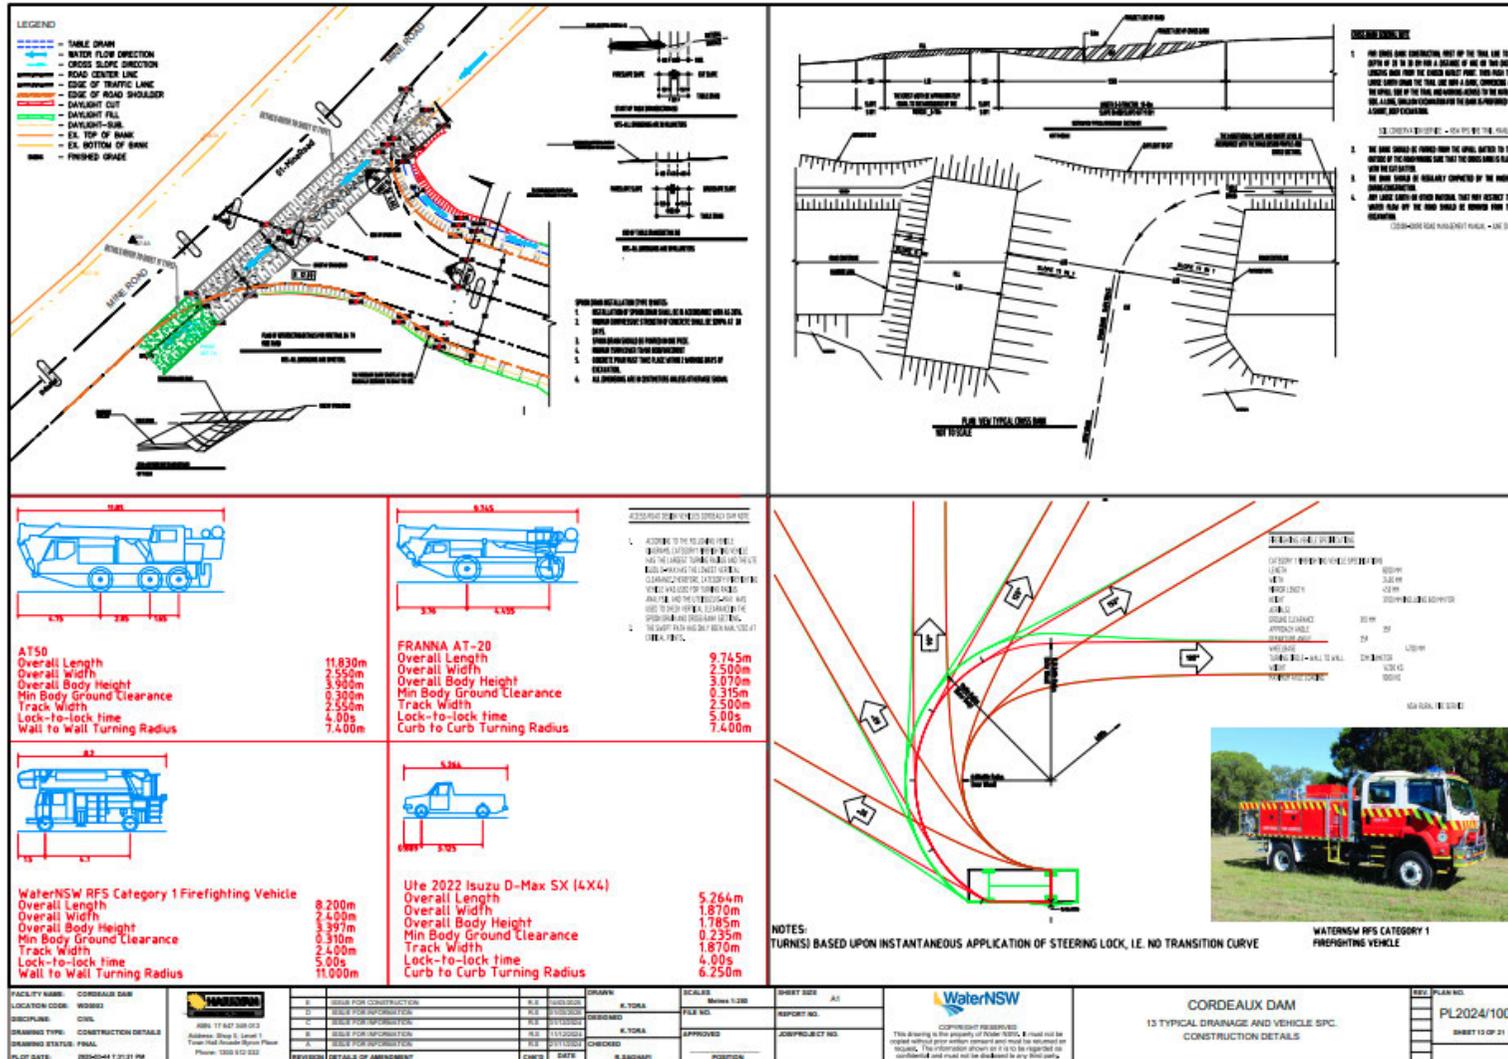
Installation of spoon drain and construction vehicle details (Source: Cordeaux Dam Construction Drawings, Water NSW)
